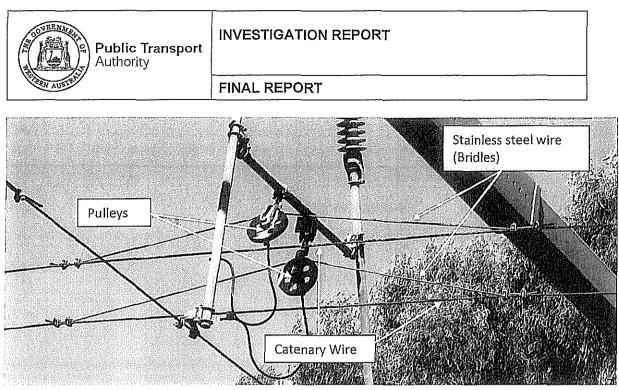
photo showing how the Catenary Wire is supported in accordance with the system design.
